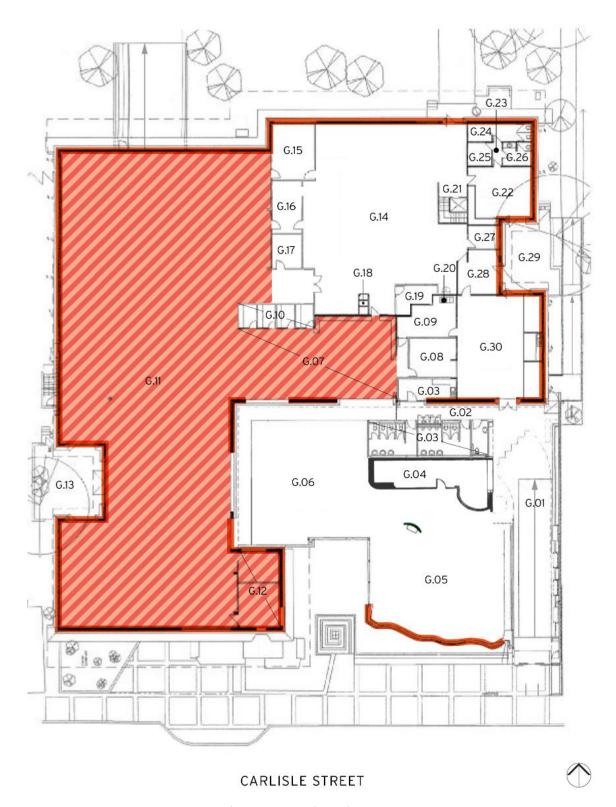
St Kilda Library ground floor plan: significant fabric, spaces and elements are highlighted
